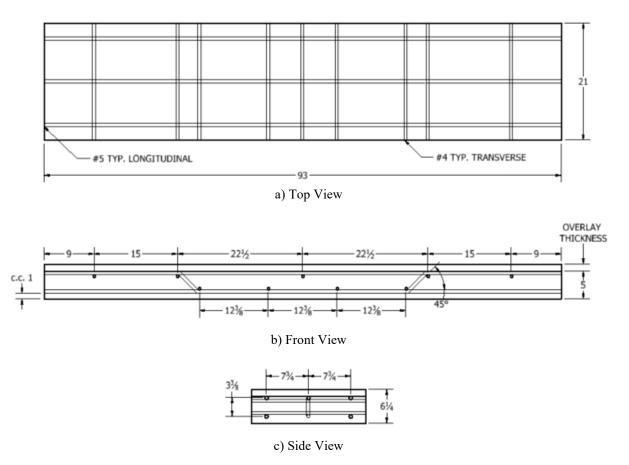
Test slab dimensions and reinforcement details (all dimensions shown in inches).
